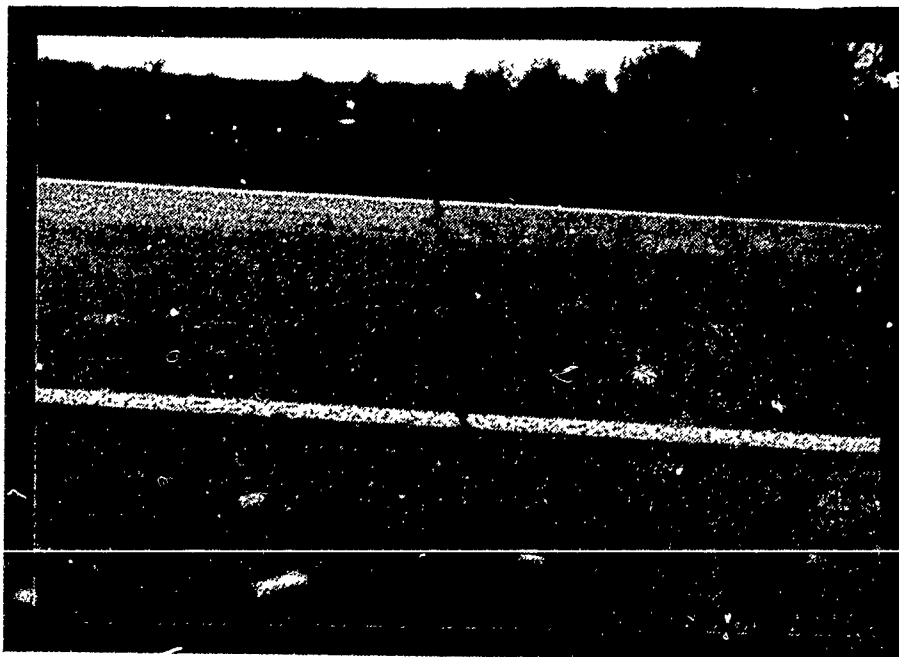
EVENLY SPACED SHRINKAGE CRACKS SUCH AS THESE ON TAXIWAY F ARE UP TO HALF AN INCH WIDE AND SHOULD BE ROUTED AND SEALED ASAP (TYPICAL).
